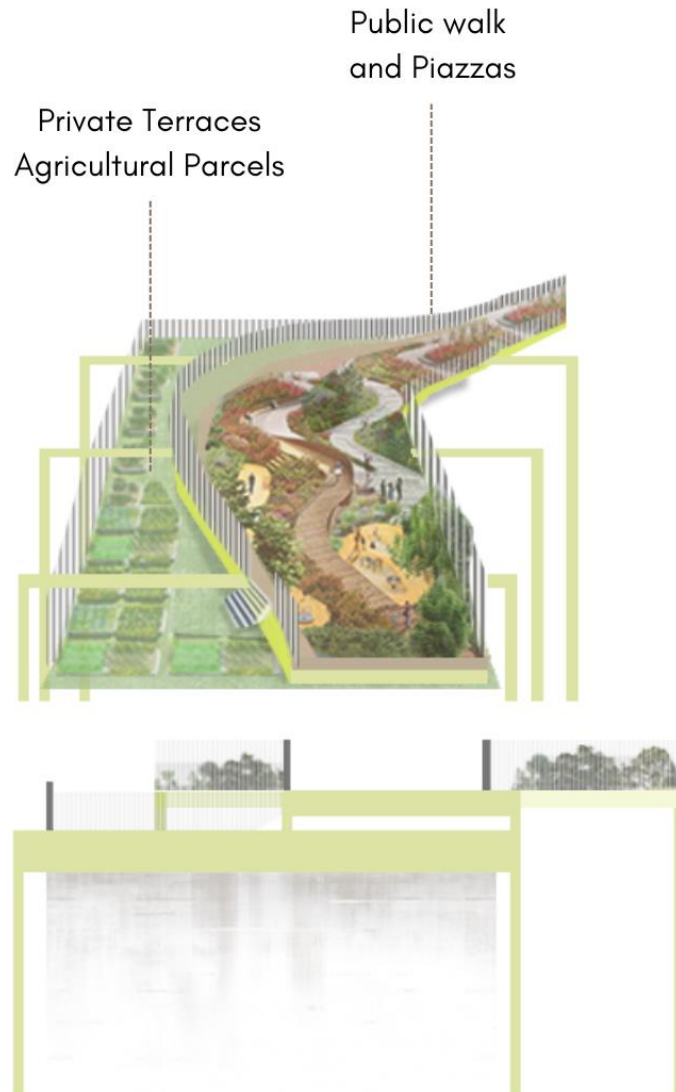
Plan detailing of the elevated roof, part 3 (by author)
